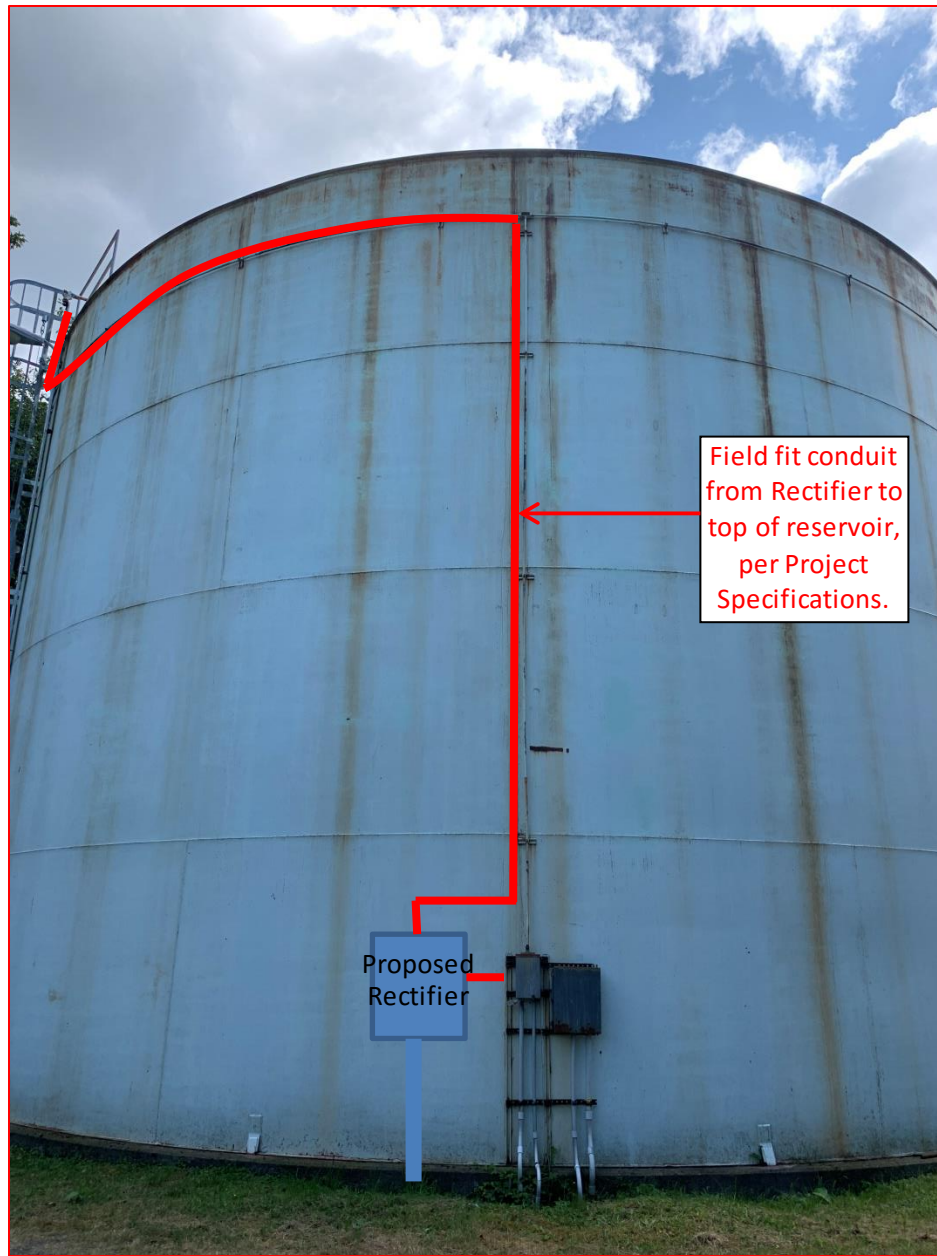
Geneva Reservoir – Proposed Rectifier Conduit Alignment
